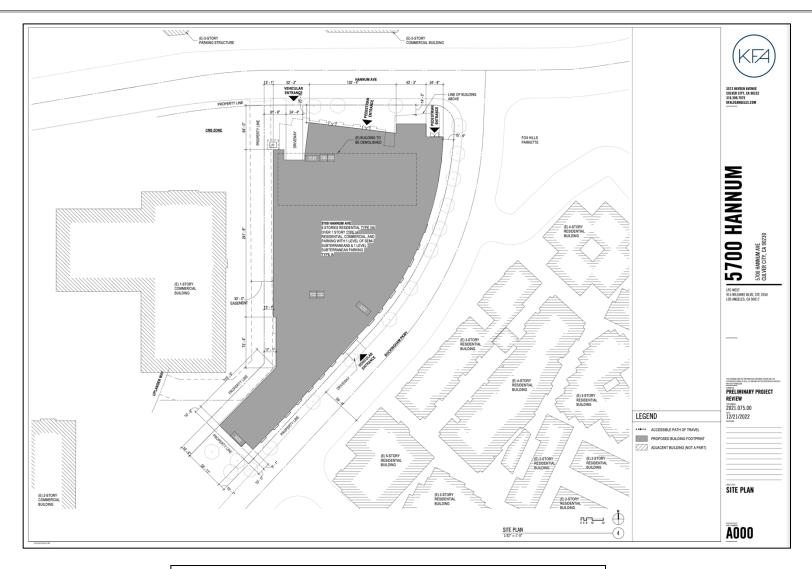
EXHIBIT C – REDUCED COPY OF SITE PLAN (NOT TO SCALE)
